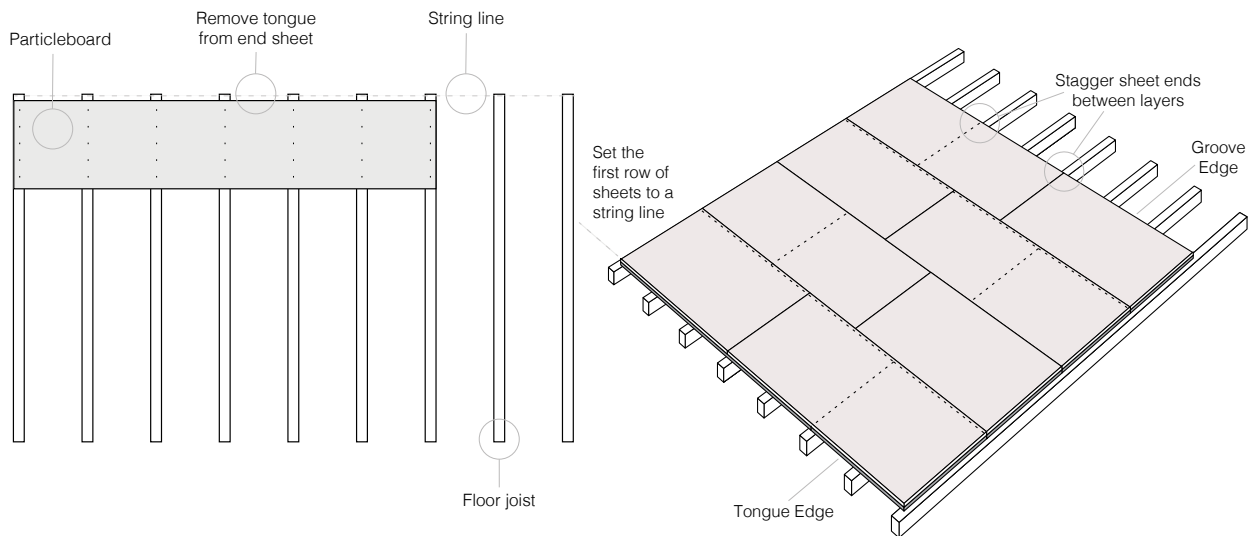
Position of the string line and first board perpendicular to the floor joists.
